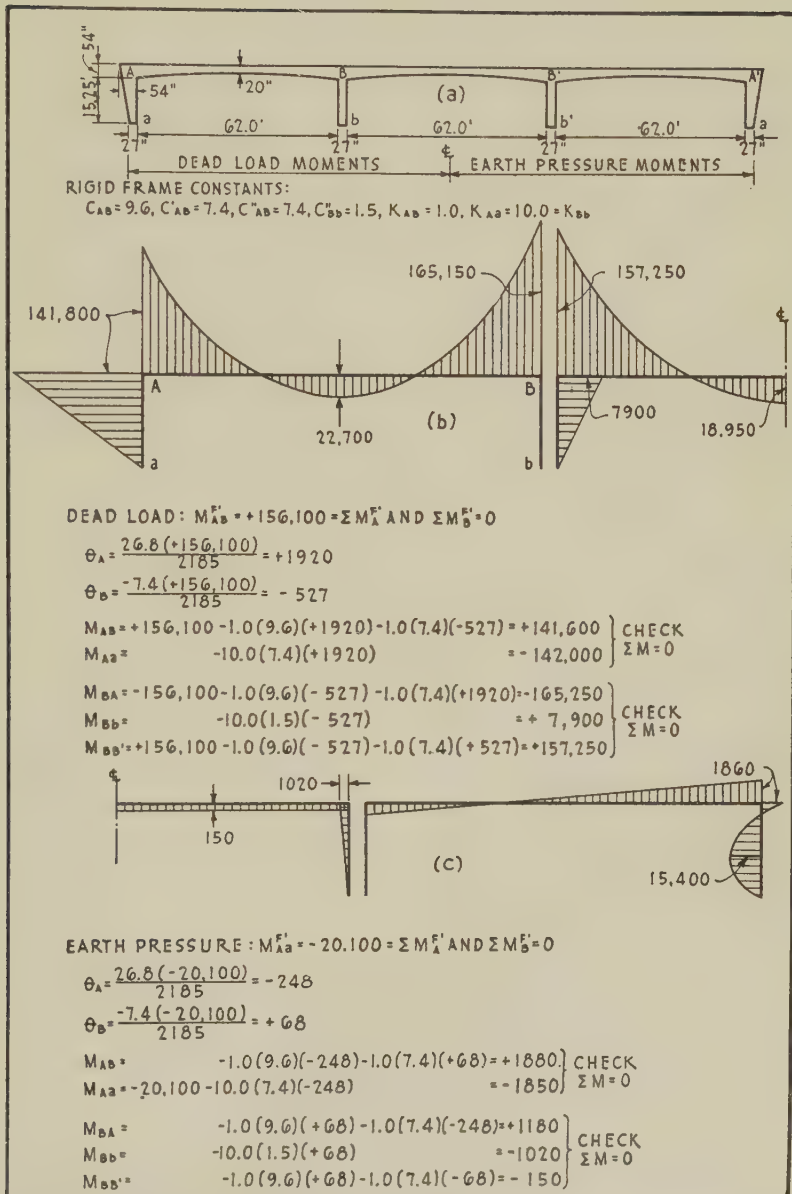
SOLUTION OF THREE SPAN SYMMETRICAL FRAME DEAD LOAD AND EARTH PRESSURE
